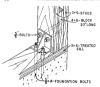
End will anchor bracket used at outside corners and door openings.
